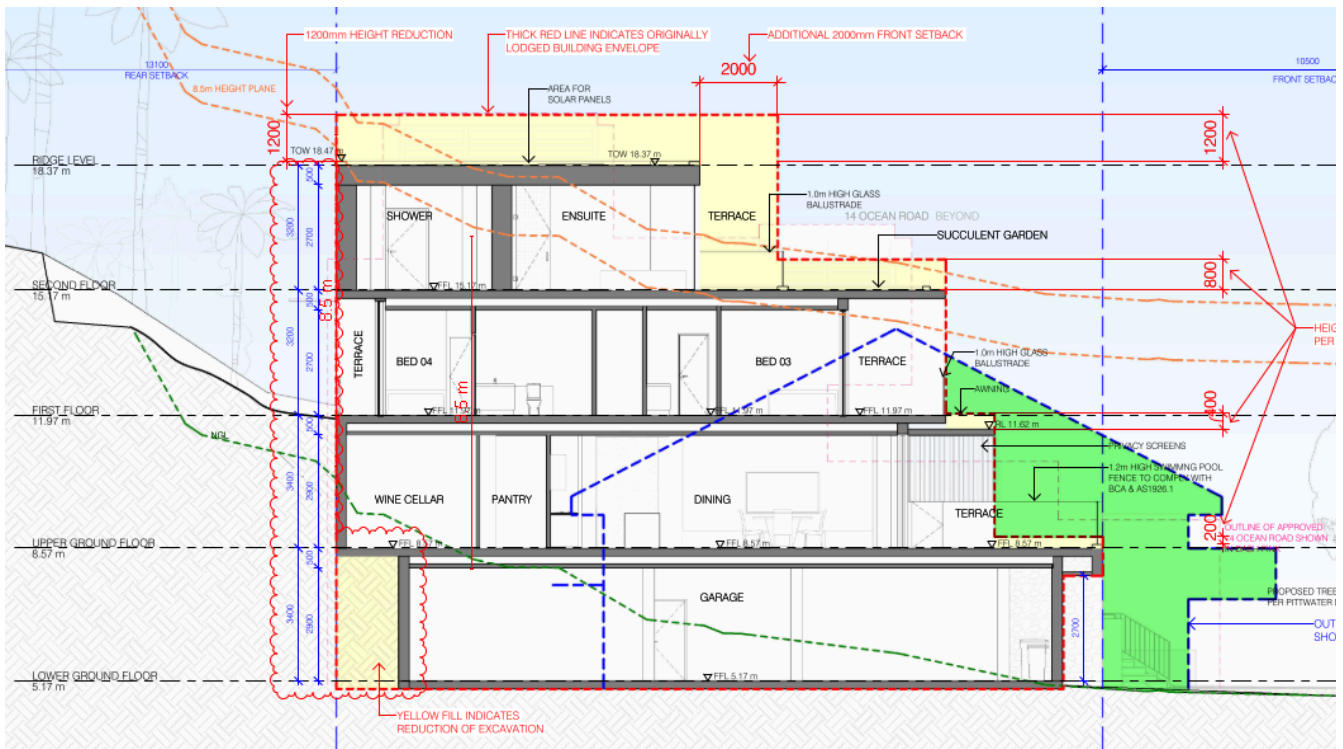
Overlay of the existing and proposed dwellings at Section 01, with the additional view corridor created at the front of the site shaded green
